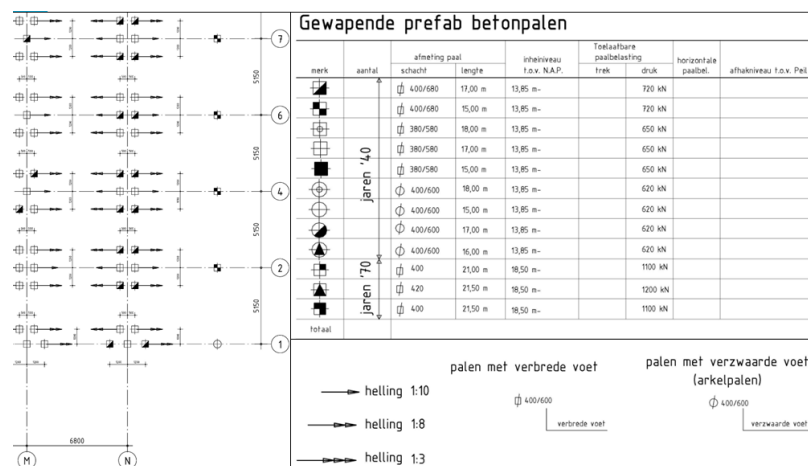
Groot Willemsplein - (Left) Table with the existing pile types, including dimensions, compressive strength, and slope (Right) Part of the existing foundation plan, including pile types, distances, and slopes.
